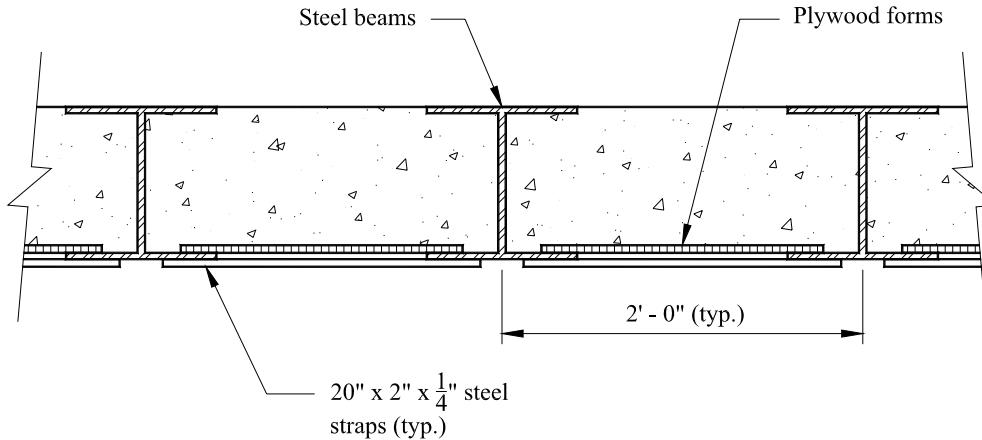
Cross-section of the original beam-in-slab system [adapted from Klaiber et al., 2004].
